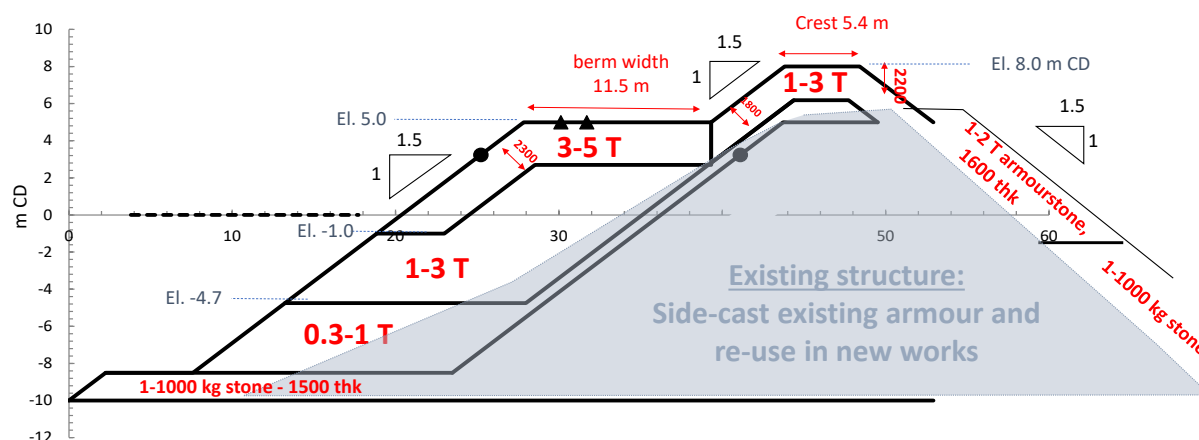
Typical cross section of Pikes Island breakwater repair
